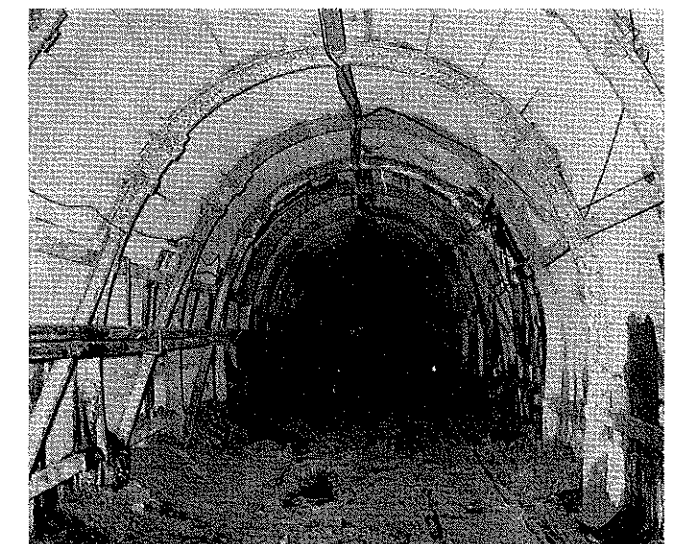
Tunnel portal construction, showing steel arches and timber lagging around tunnel.
